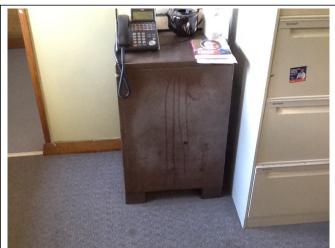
Photo094 Result: Asbestos - Presumed Positive Building/Level: Building 4-Level Two Room/Location: 4R2018 (Staff room)-North Feature/Material: Heater-Insulation
